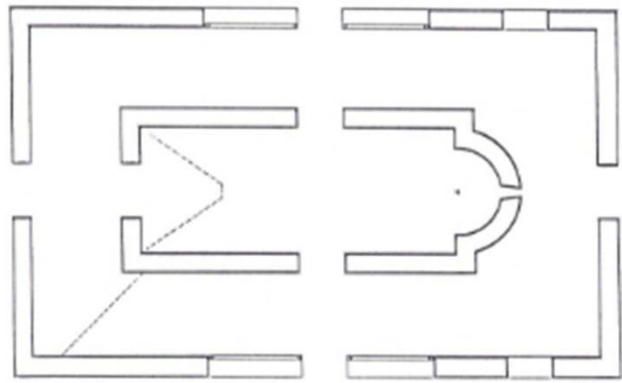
Plan of a single-aisle church with corridors on four sides
